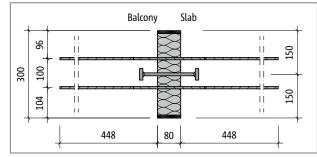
Schöck Isokorb® T type Q-P-V1: Product layout
